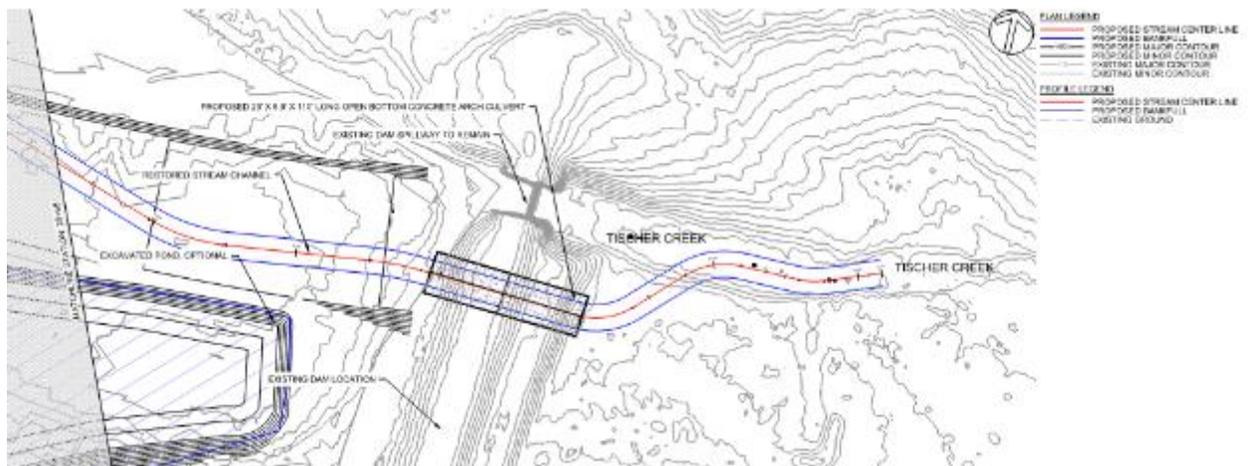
Plan view schematic of the open-bottom culvert, including constructed pond alternative.
